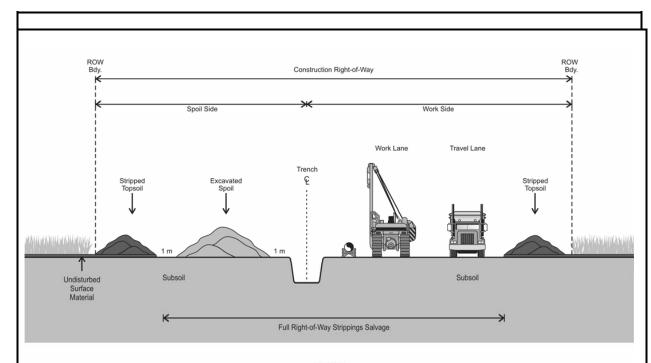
A-1 TOPSOIL SALVAGE - TRENCH AND SPOIL AREA
